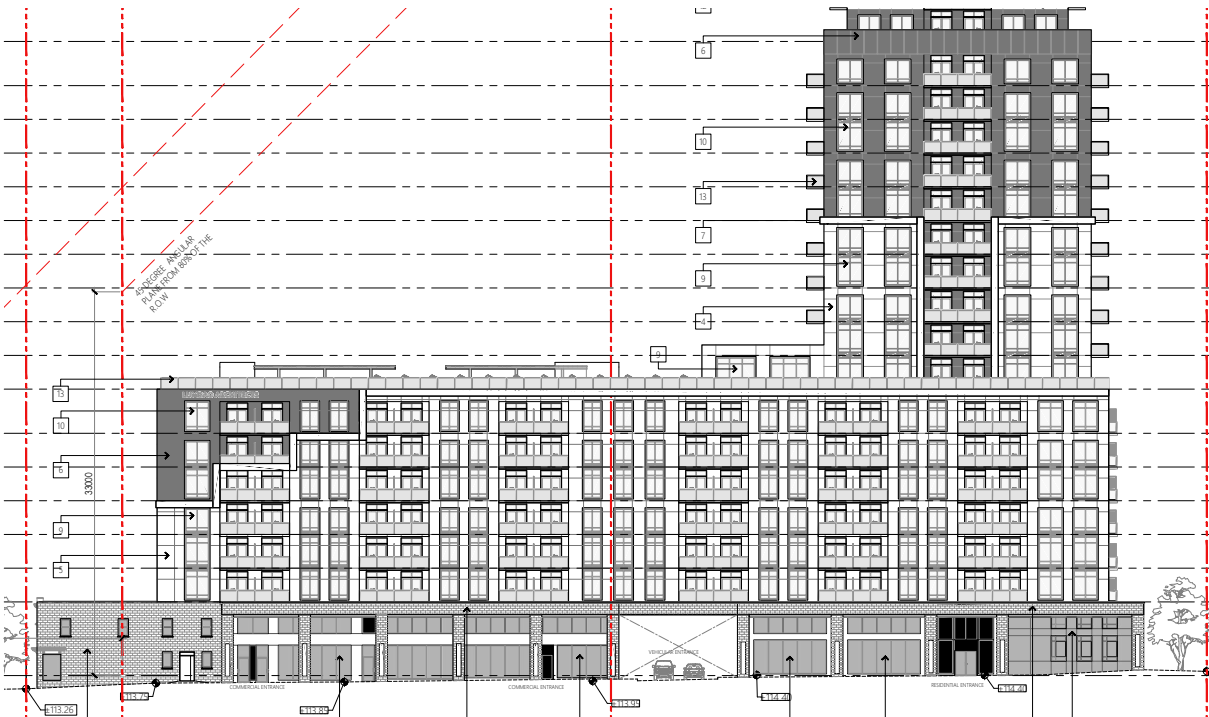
Excerpt of proposed east elevation (RA Lumbao Architects, 2025).
